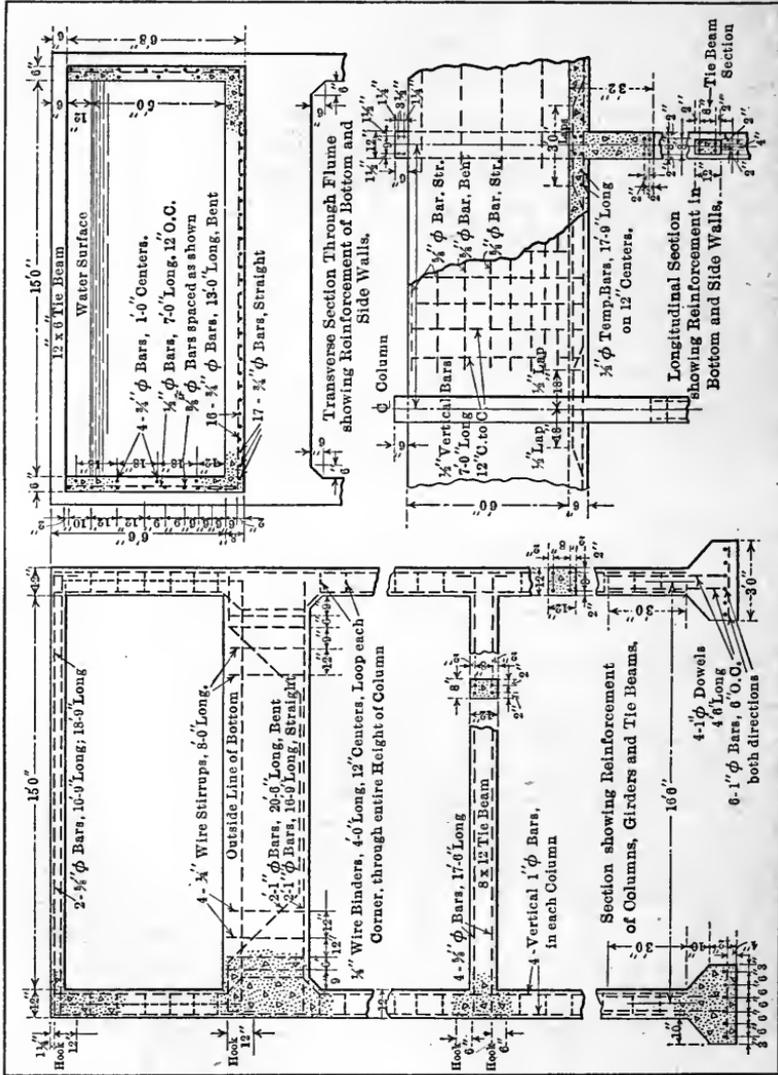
Reinforced concrete elevated flume. Naches Power Canal, Wash.
